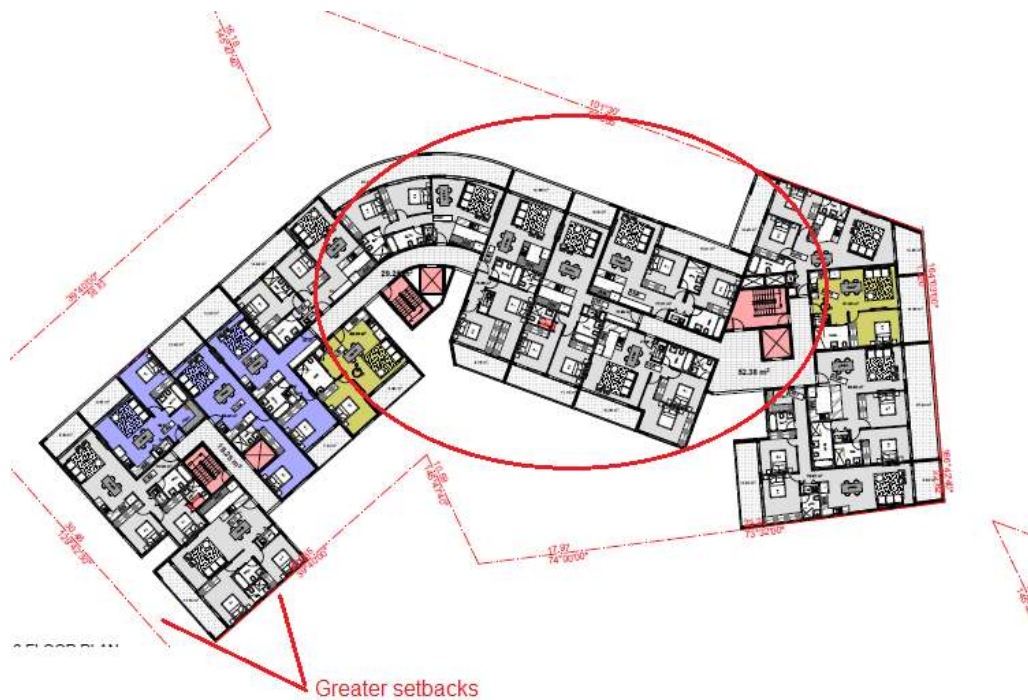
Original proposal – typical floor plan of each levels, one long continuous building.
